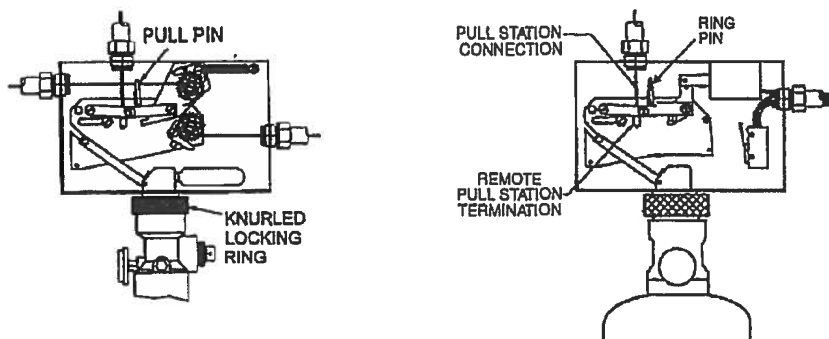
Single Cylinder Installation Using Model MCH3/ECH3/NMCH3 Control Head
